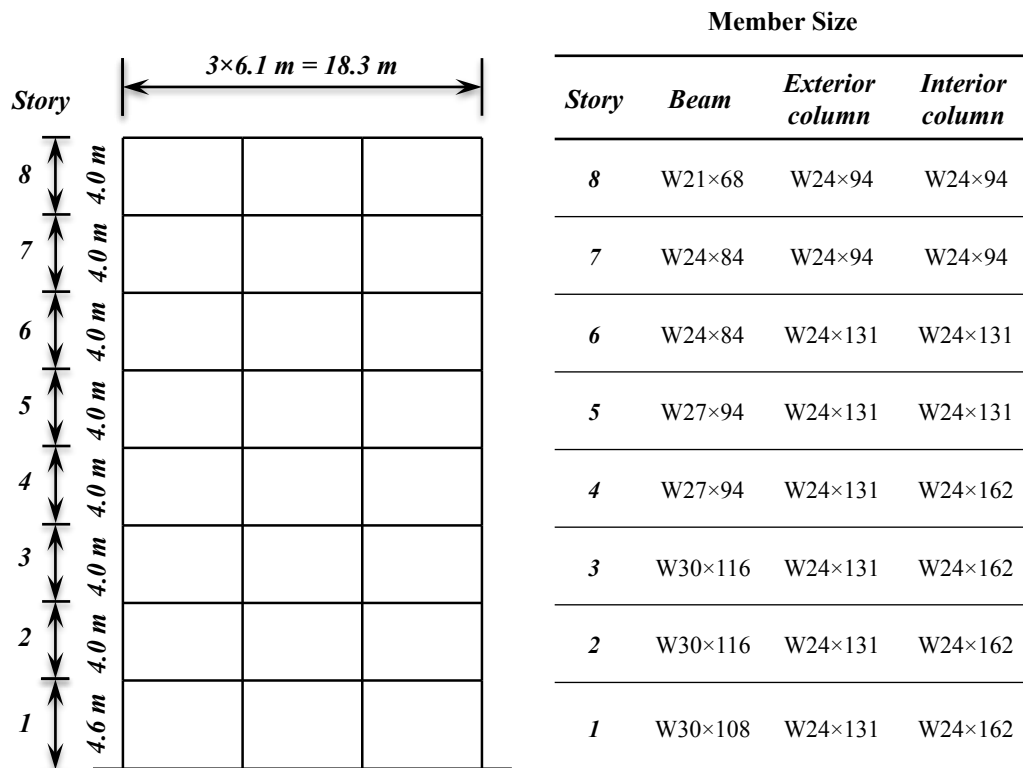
Elevation of building S-8 and the beam and column member sizes.
